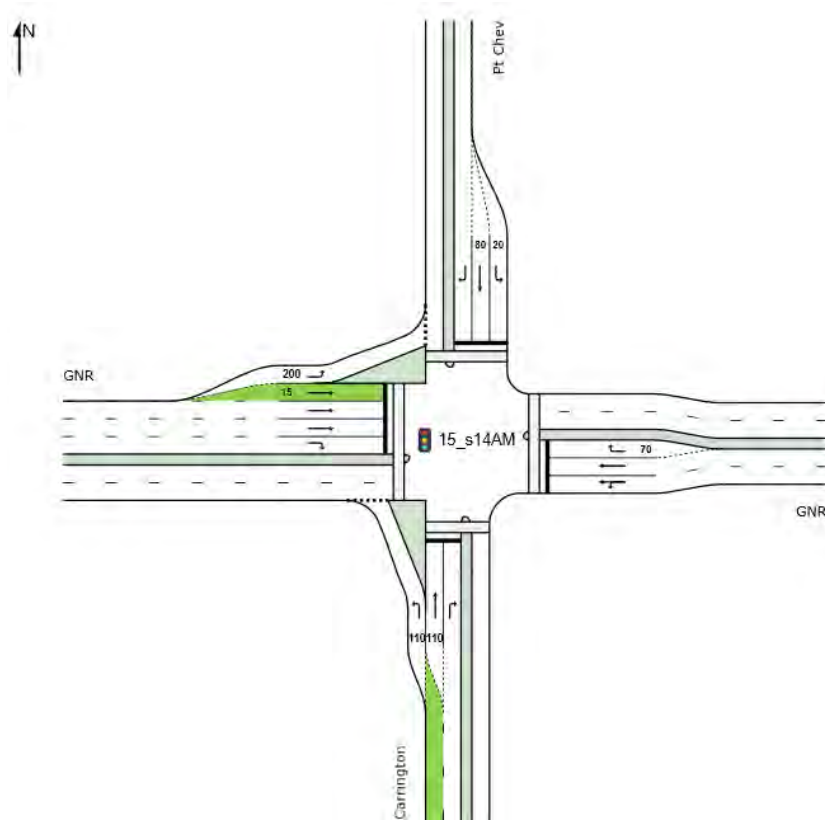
SIDRA layout for Great North Road / Point Chevalier Road / Carrington Road (green sections represent bus lanes).
